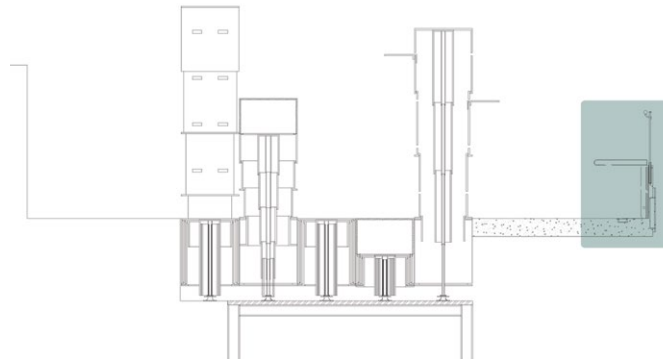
Final Sectional Elevation of Proposed Stall Configuration (Author, 2016)
